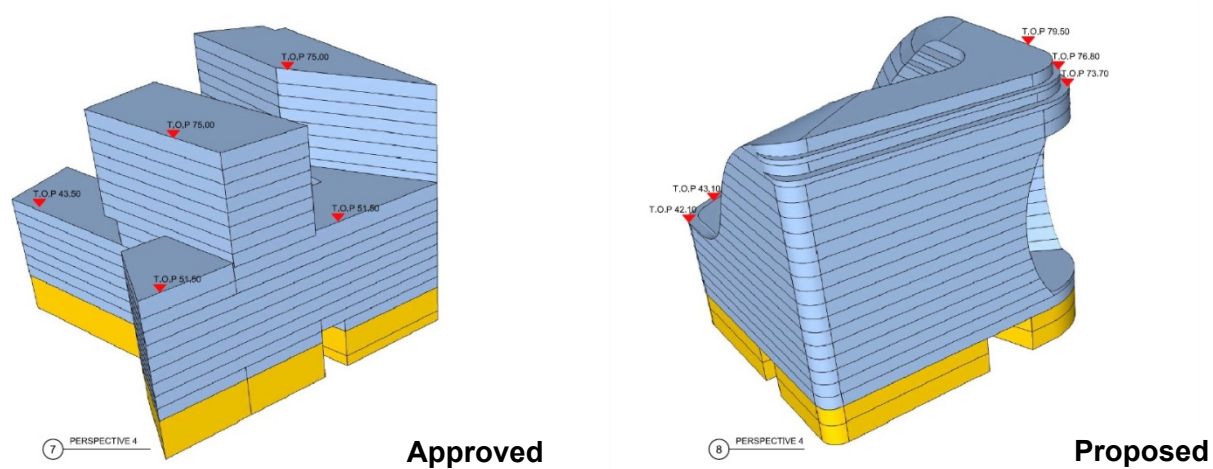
Comparison between building envelopes, as viewed from corner future Ebsworth Street and future Tweed Place
